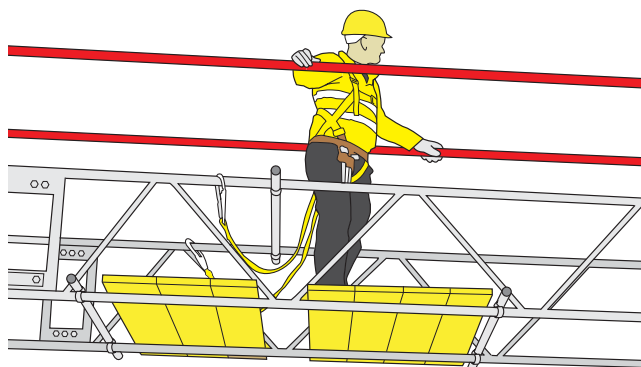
An example of bridging with beams using a double lanyard, temporary boarding and scaffolders' guardrails.
